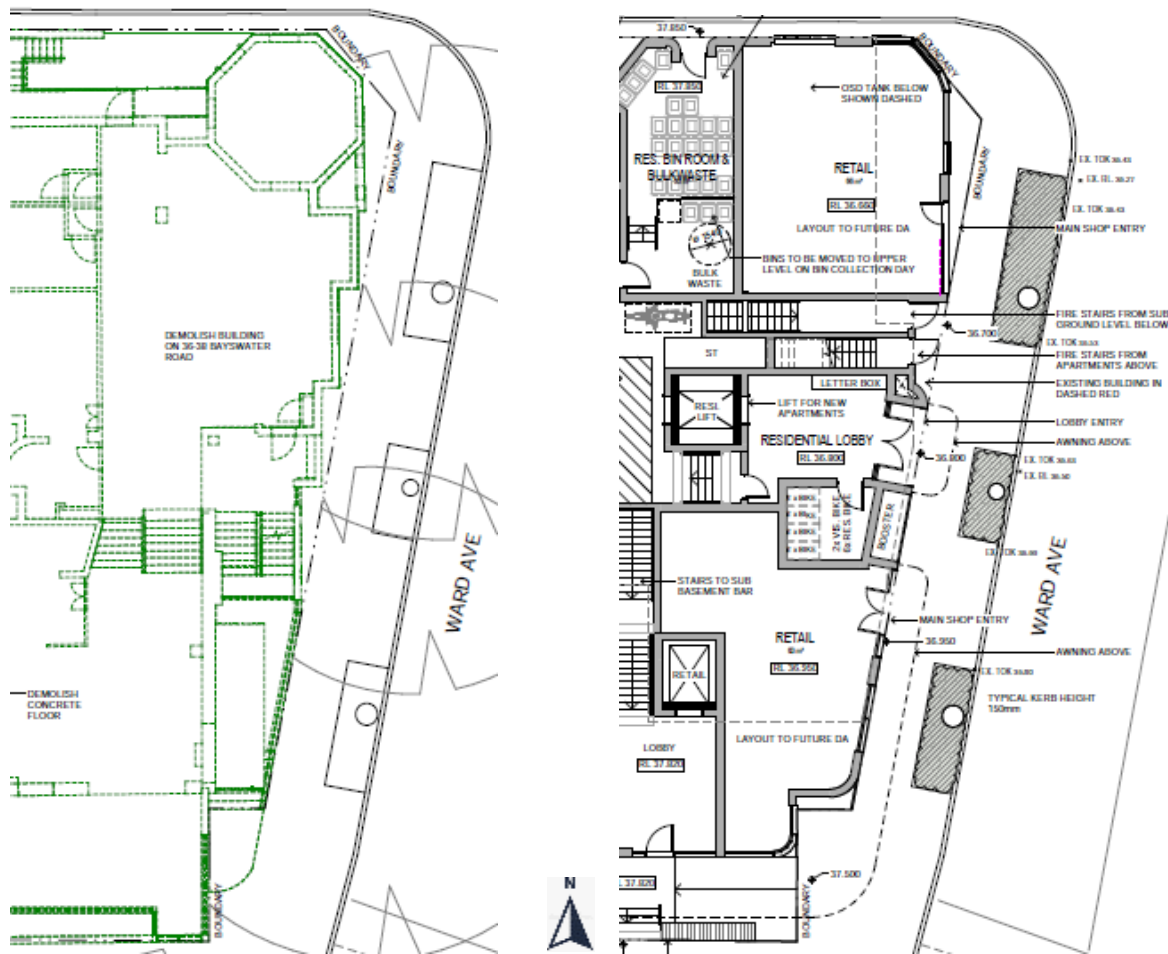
Existing (left) and proposed (right) building footprint of new corner building
